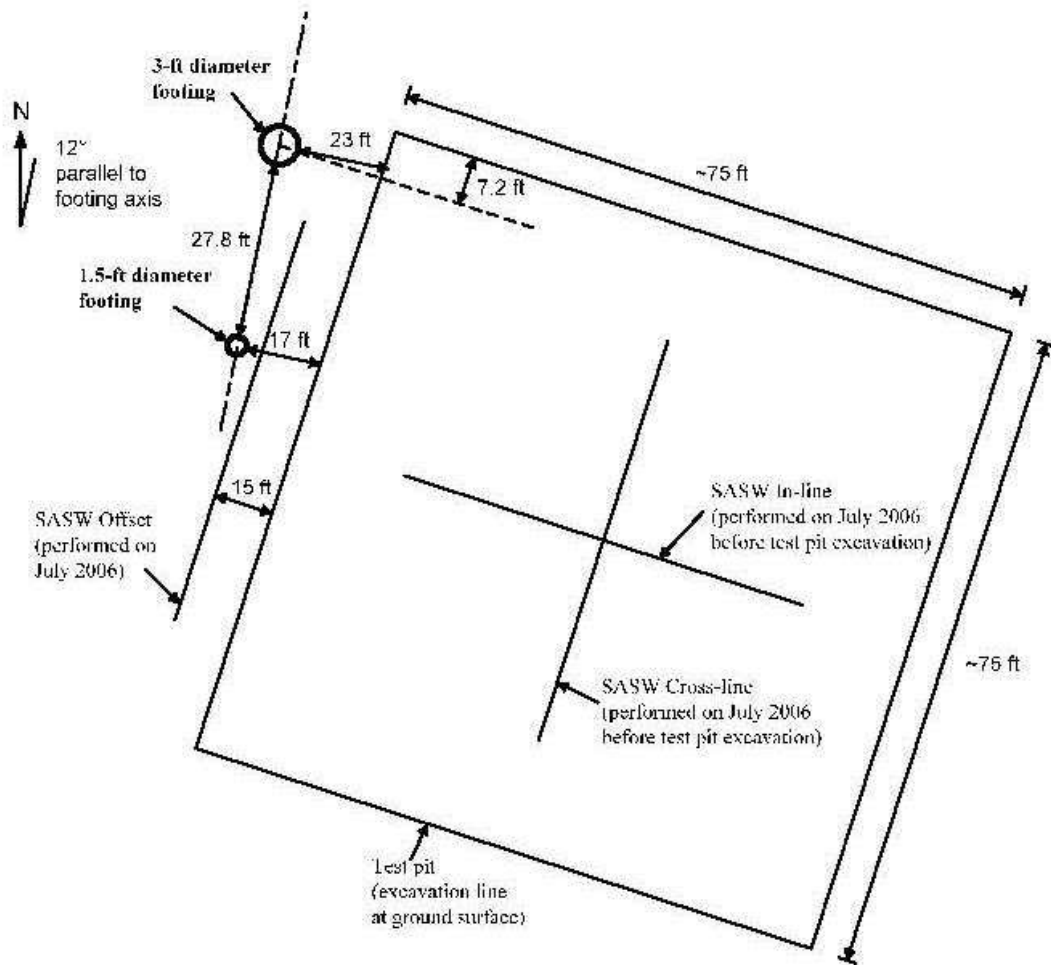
Plan view of Test Pit 6 (not to scale) (from Park, 2010)
